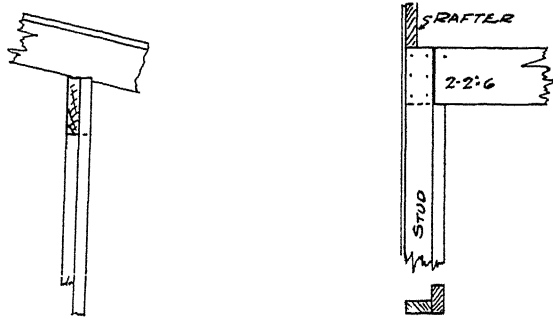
Sections thru end, showing the method of fastening the two 2- by 6- inch supports which extend thru the house to the studs at the end.
